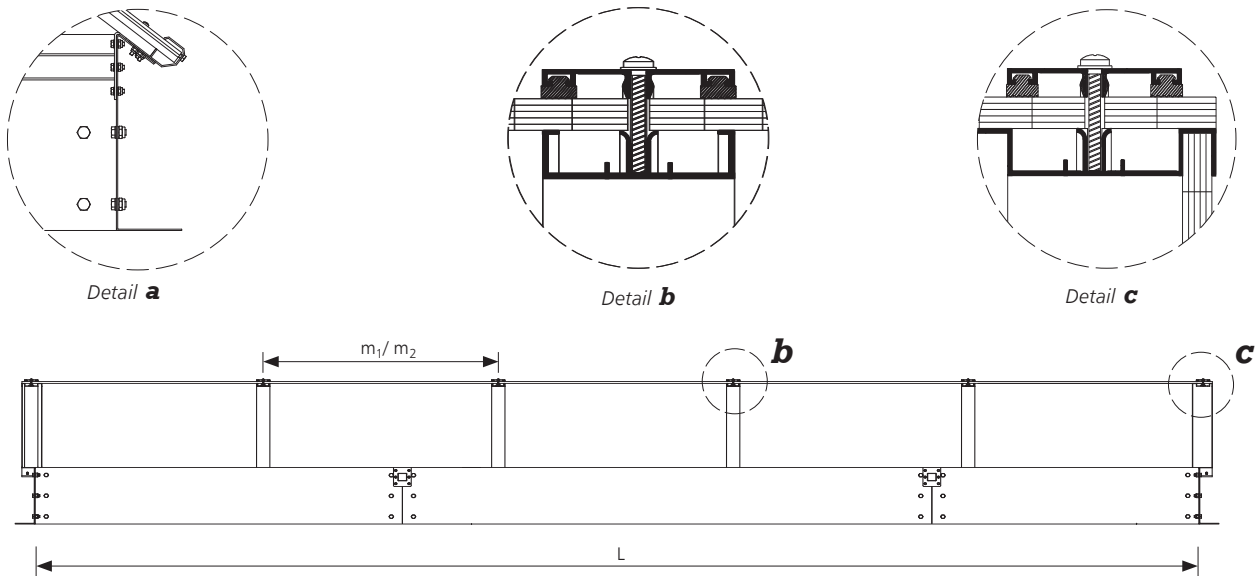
Cross section B-B of mcr PROLIGHT arch shaped continuous rooflight
